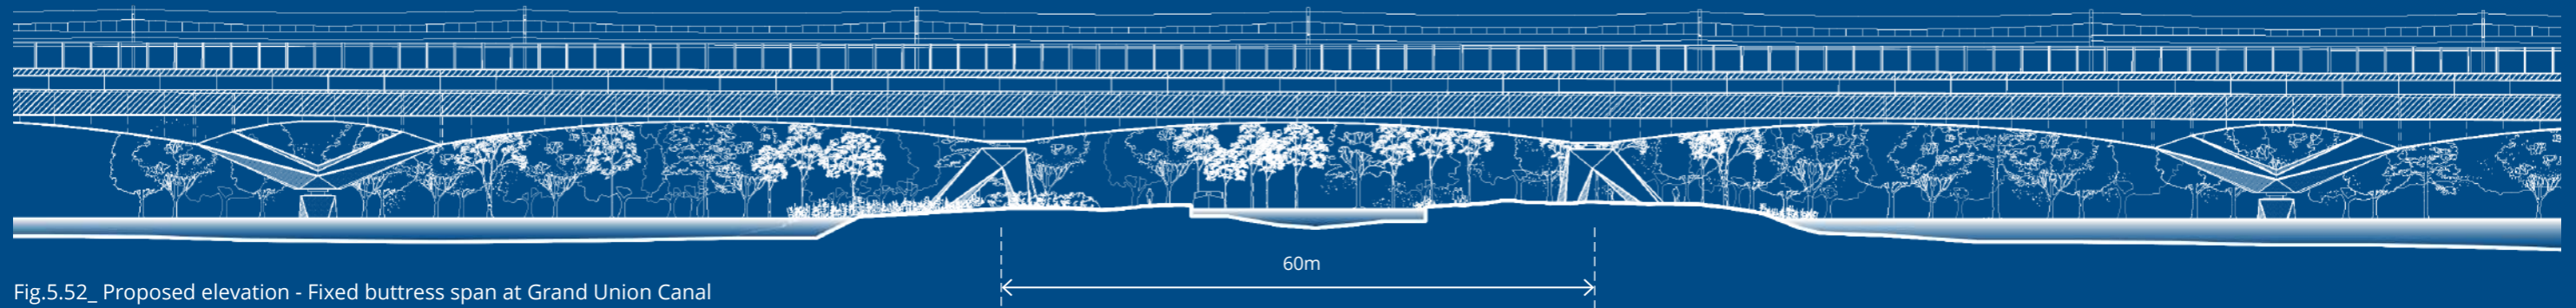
\_ Proposed elevation - Fixed buttress span at Grand Union Canal
